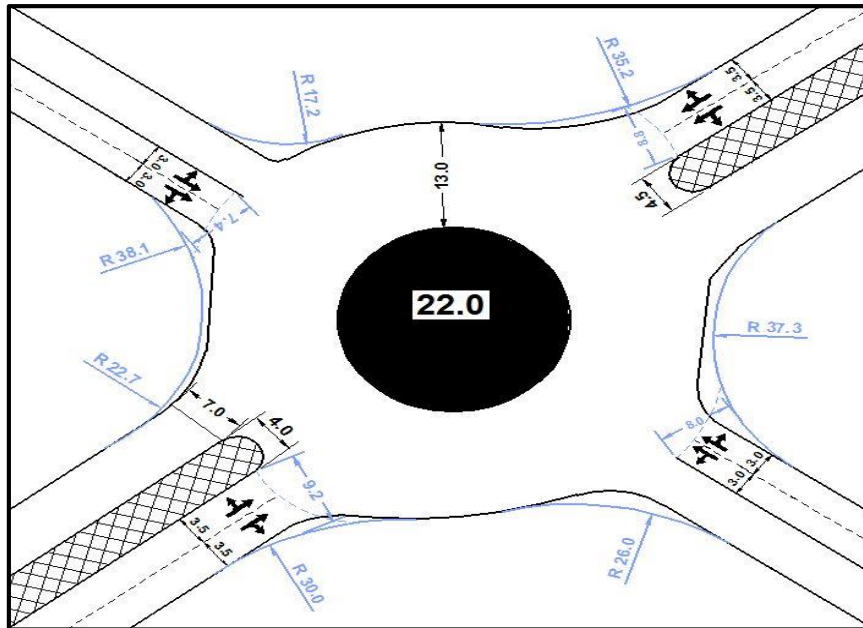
Improvement Proposal for Al-Ghadeer roundabout
